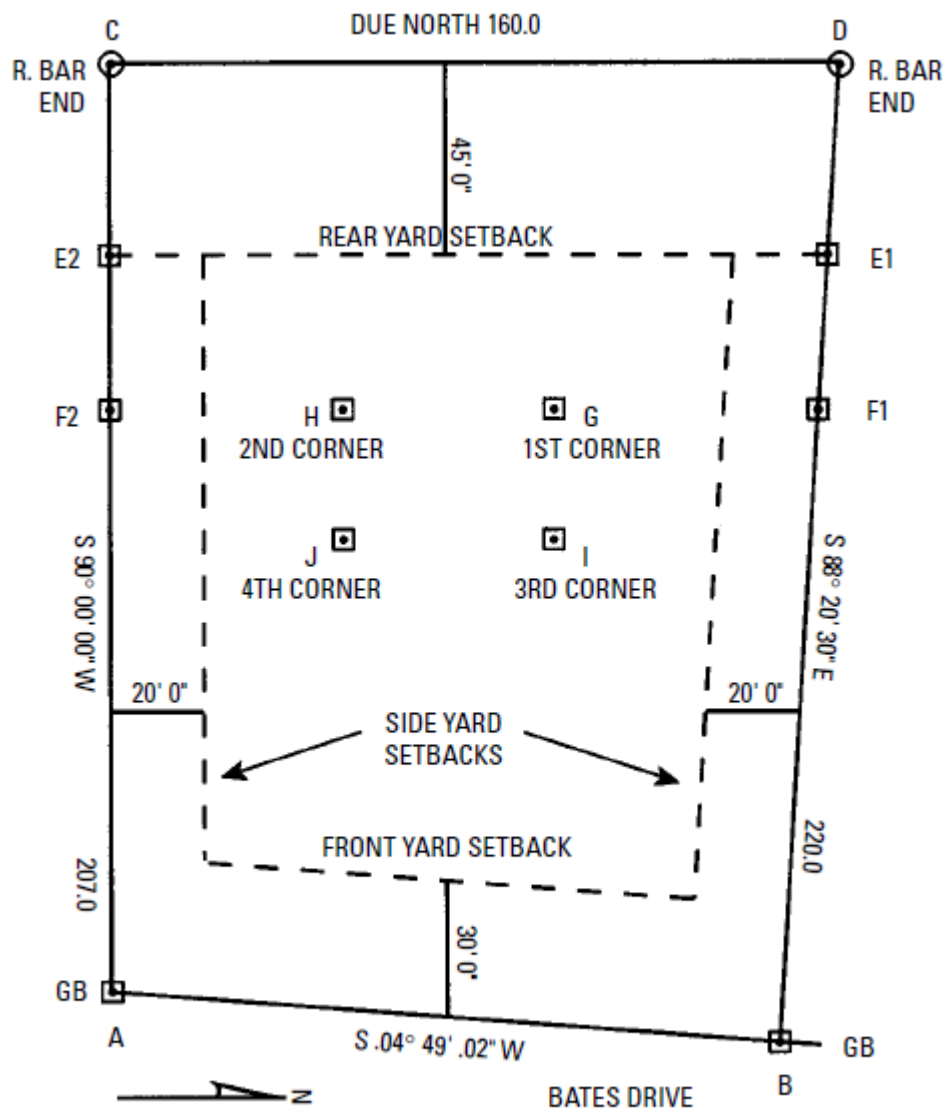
Steps 1 to 8. Laying-out with a transit level.
